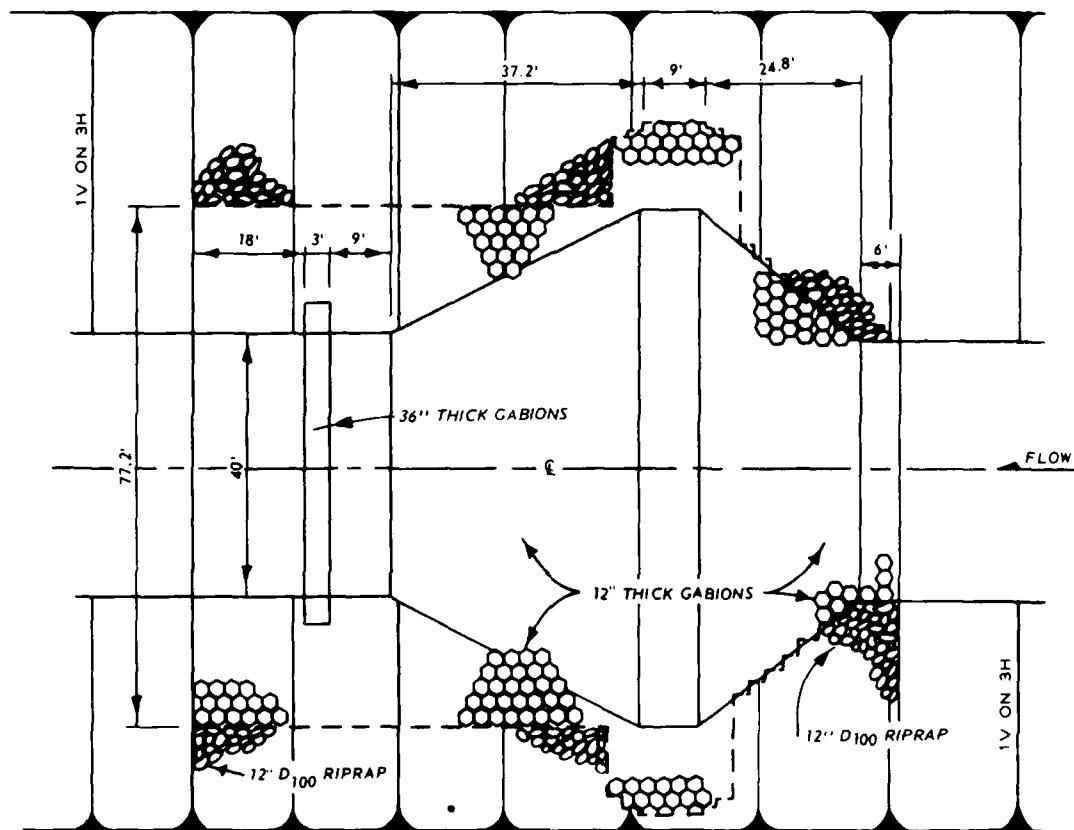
Recommended gabion and riprap protection for typical type I structure (6.2 ft high)
